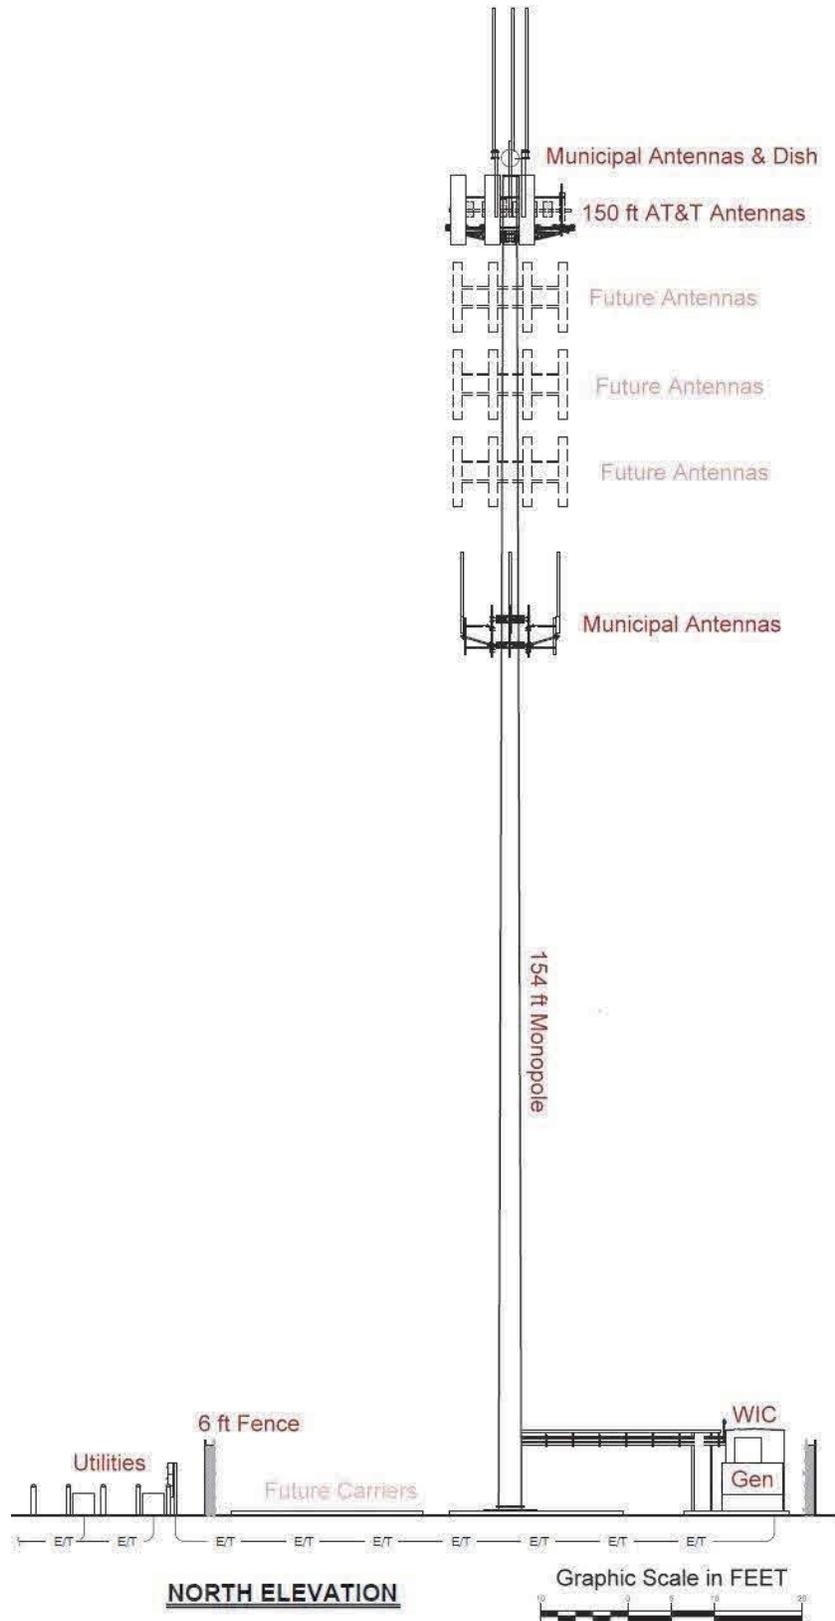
Plan Showing the Proposed Elevation Character of the Project
